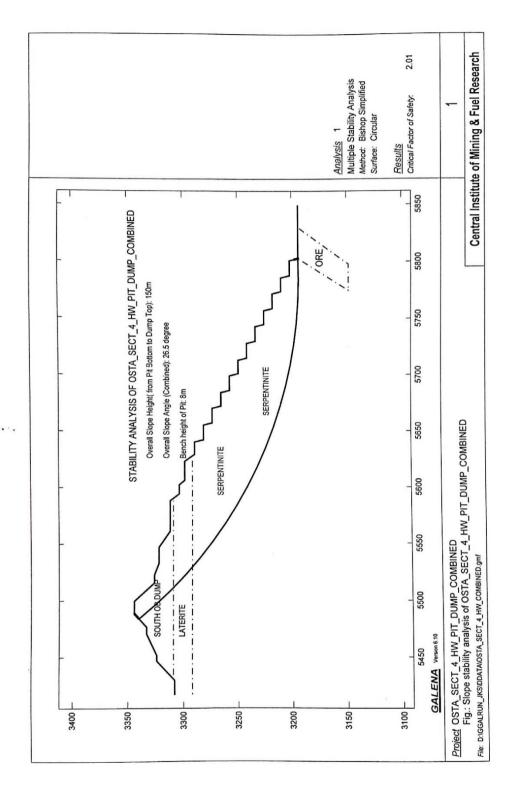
Stability analysis of Pit and Dump combined slope along Sect-4 Hangwall
